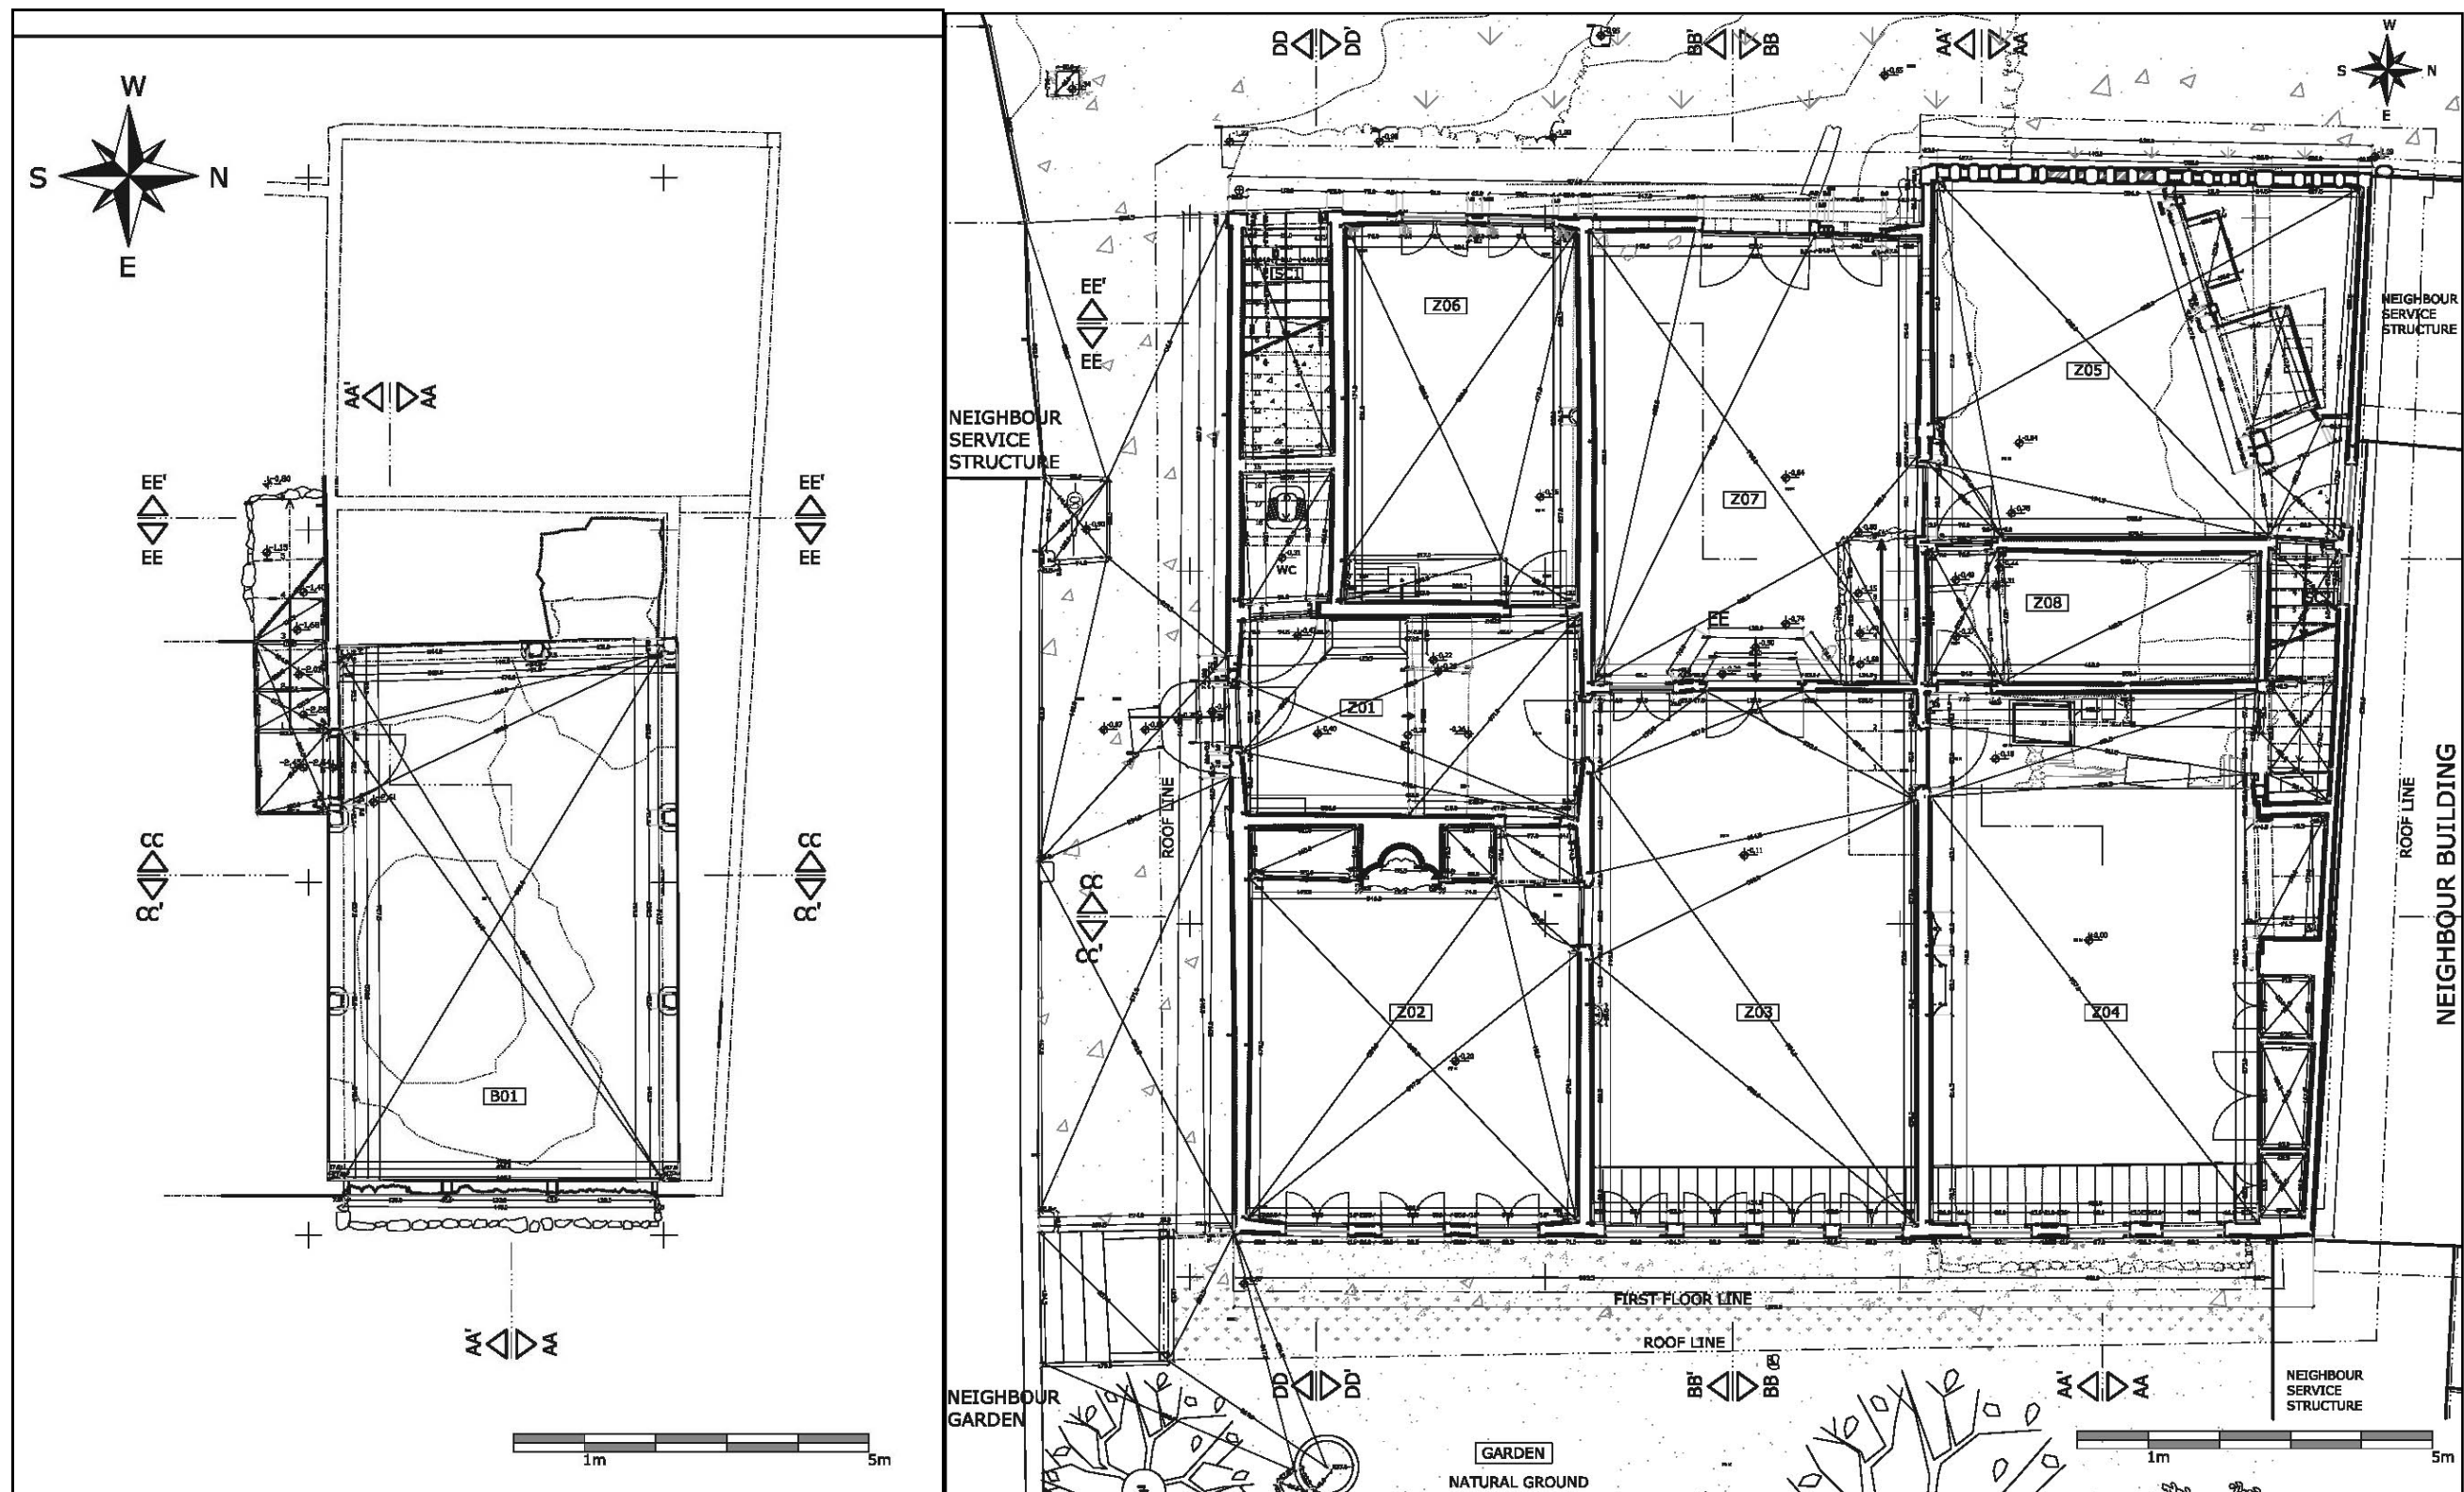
Basement Floor Plan: 1/100 (presented in 1/50 at Jury)
